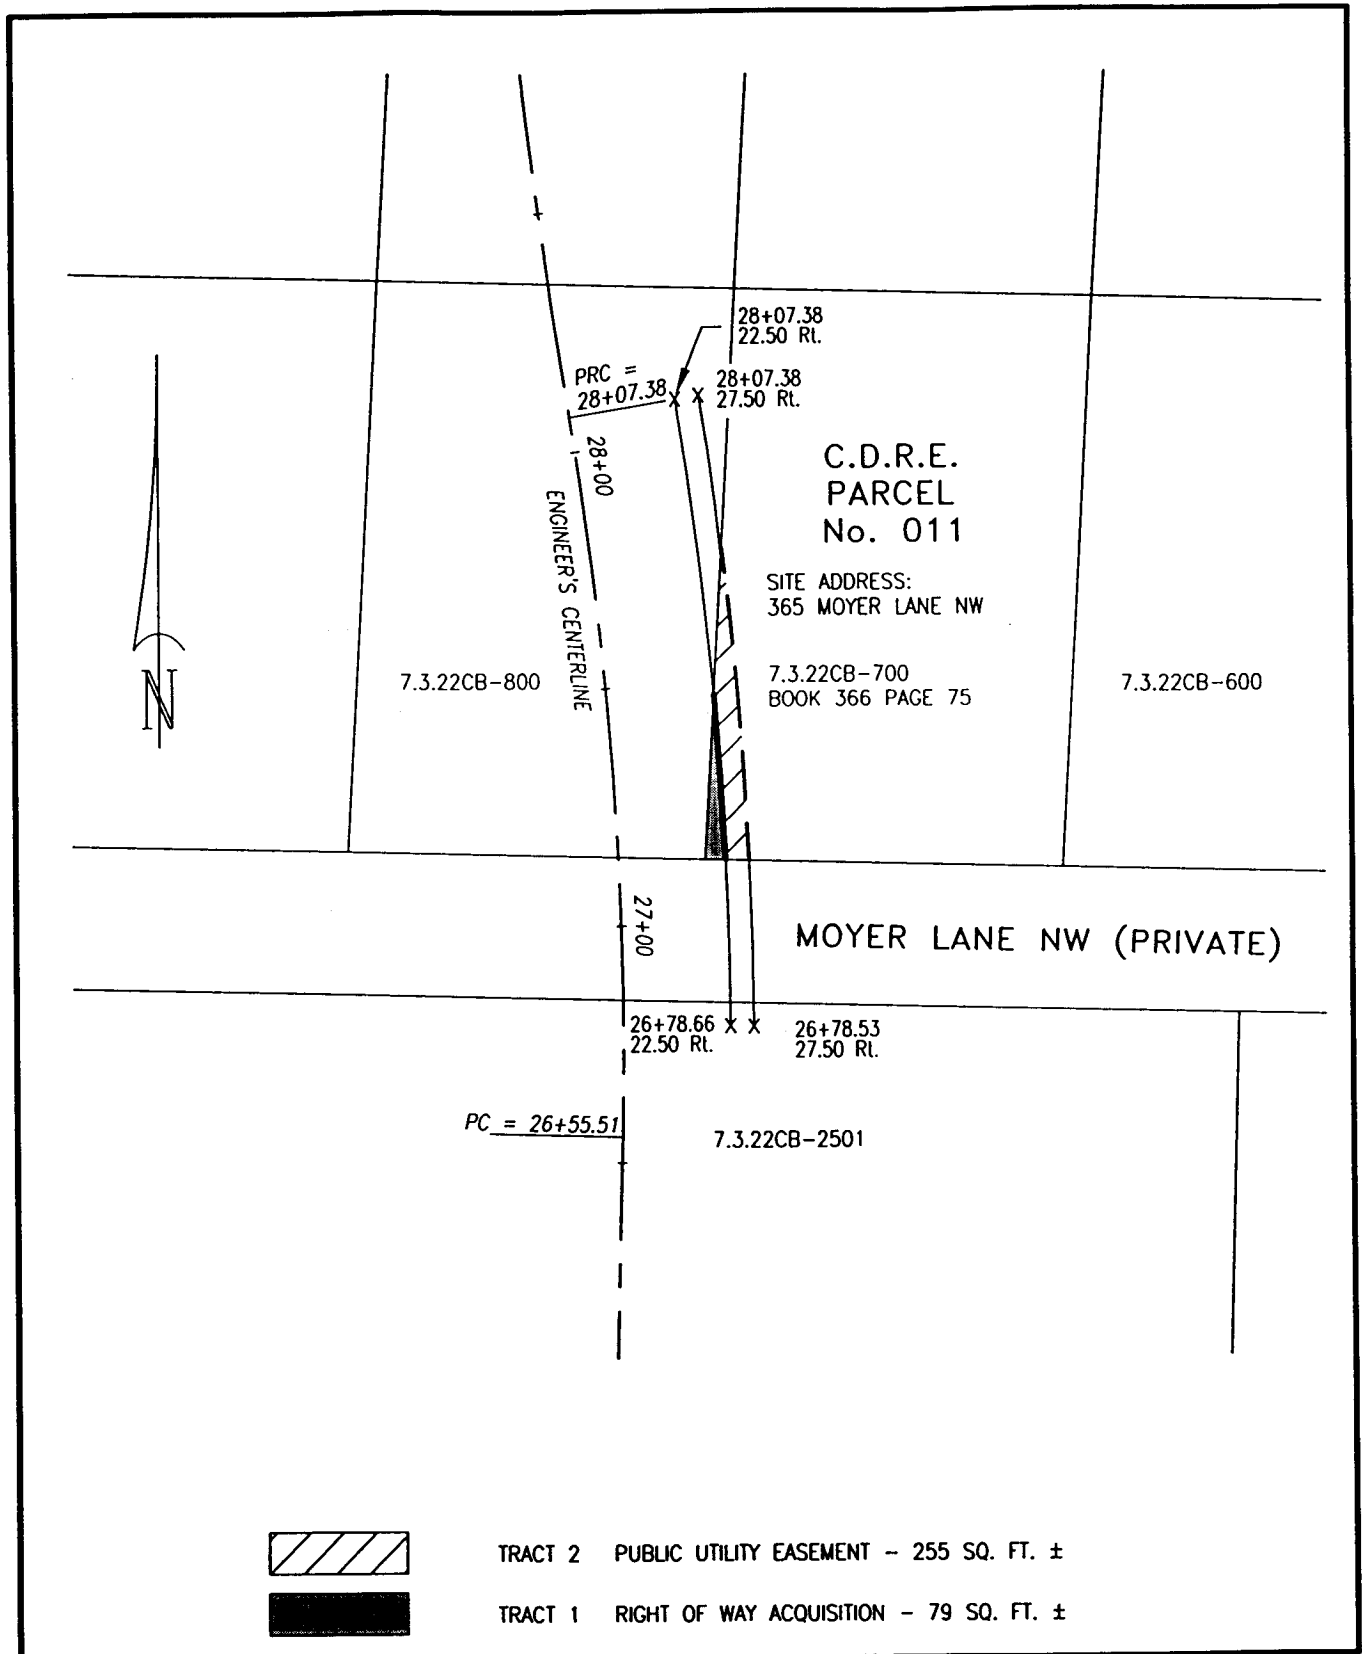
EXHIBIT B STREET IMPROVEMENT WALLACE ROAD LOCAL ACCESS	40 20 0 40 	CITY OF SALEM DEPARTMENT OF PUBLIC WORKS
